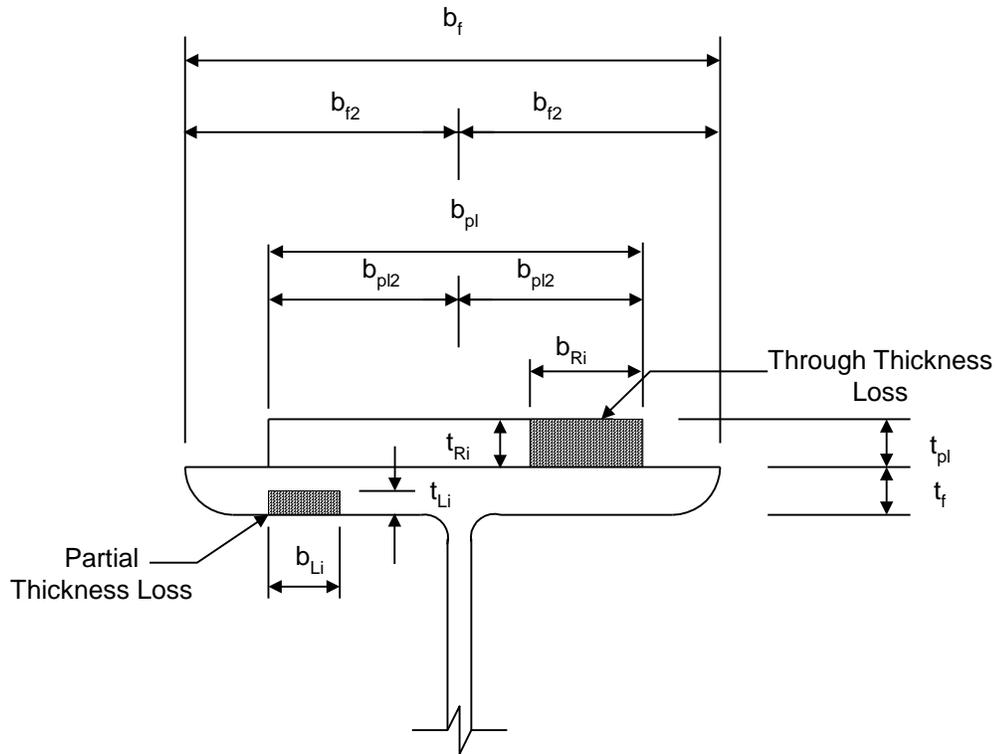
Cross-Sectional View of Rolled Beam with Section Losses
